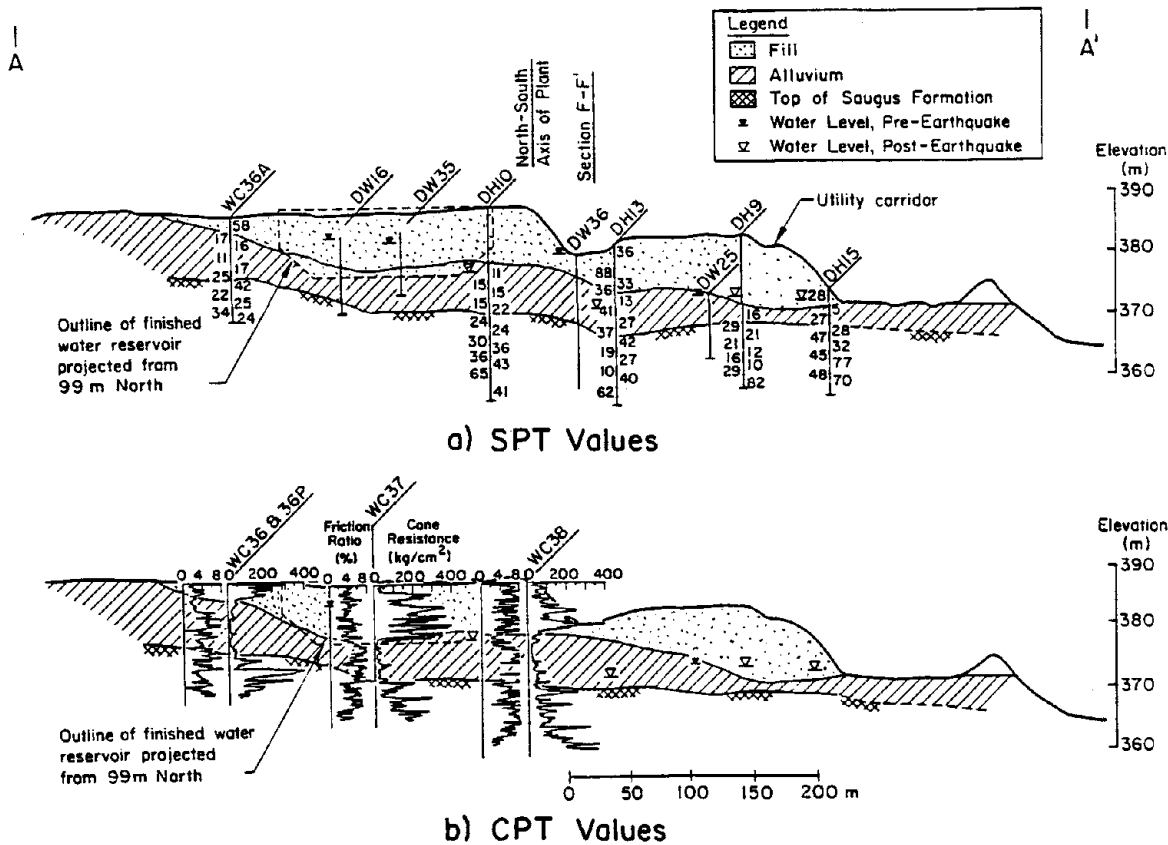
Soil Profile at Cross-Section A-A', Jensen Plant
